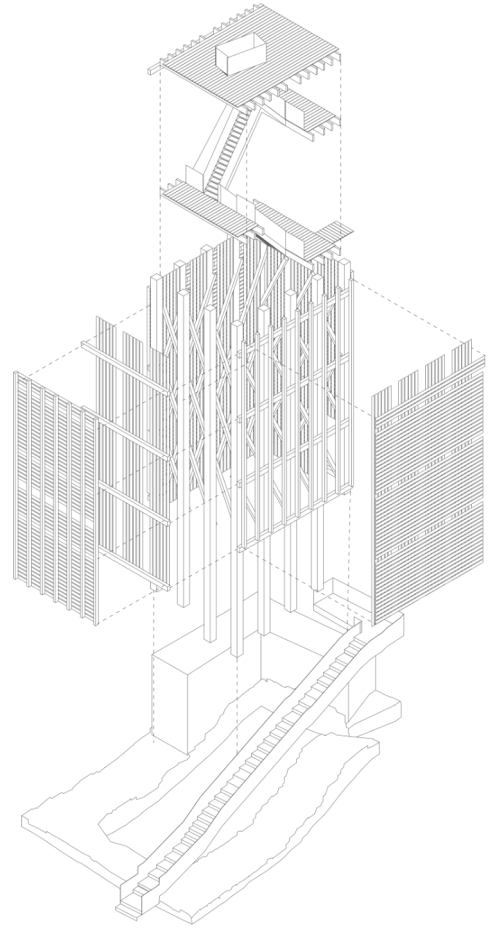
Lookout tower exploded isometric 1:400 (A4)
